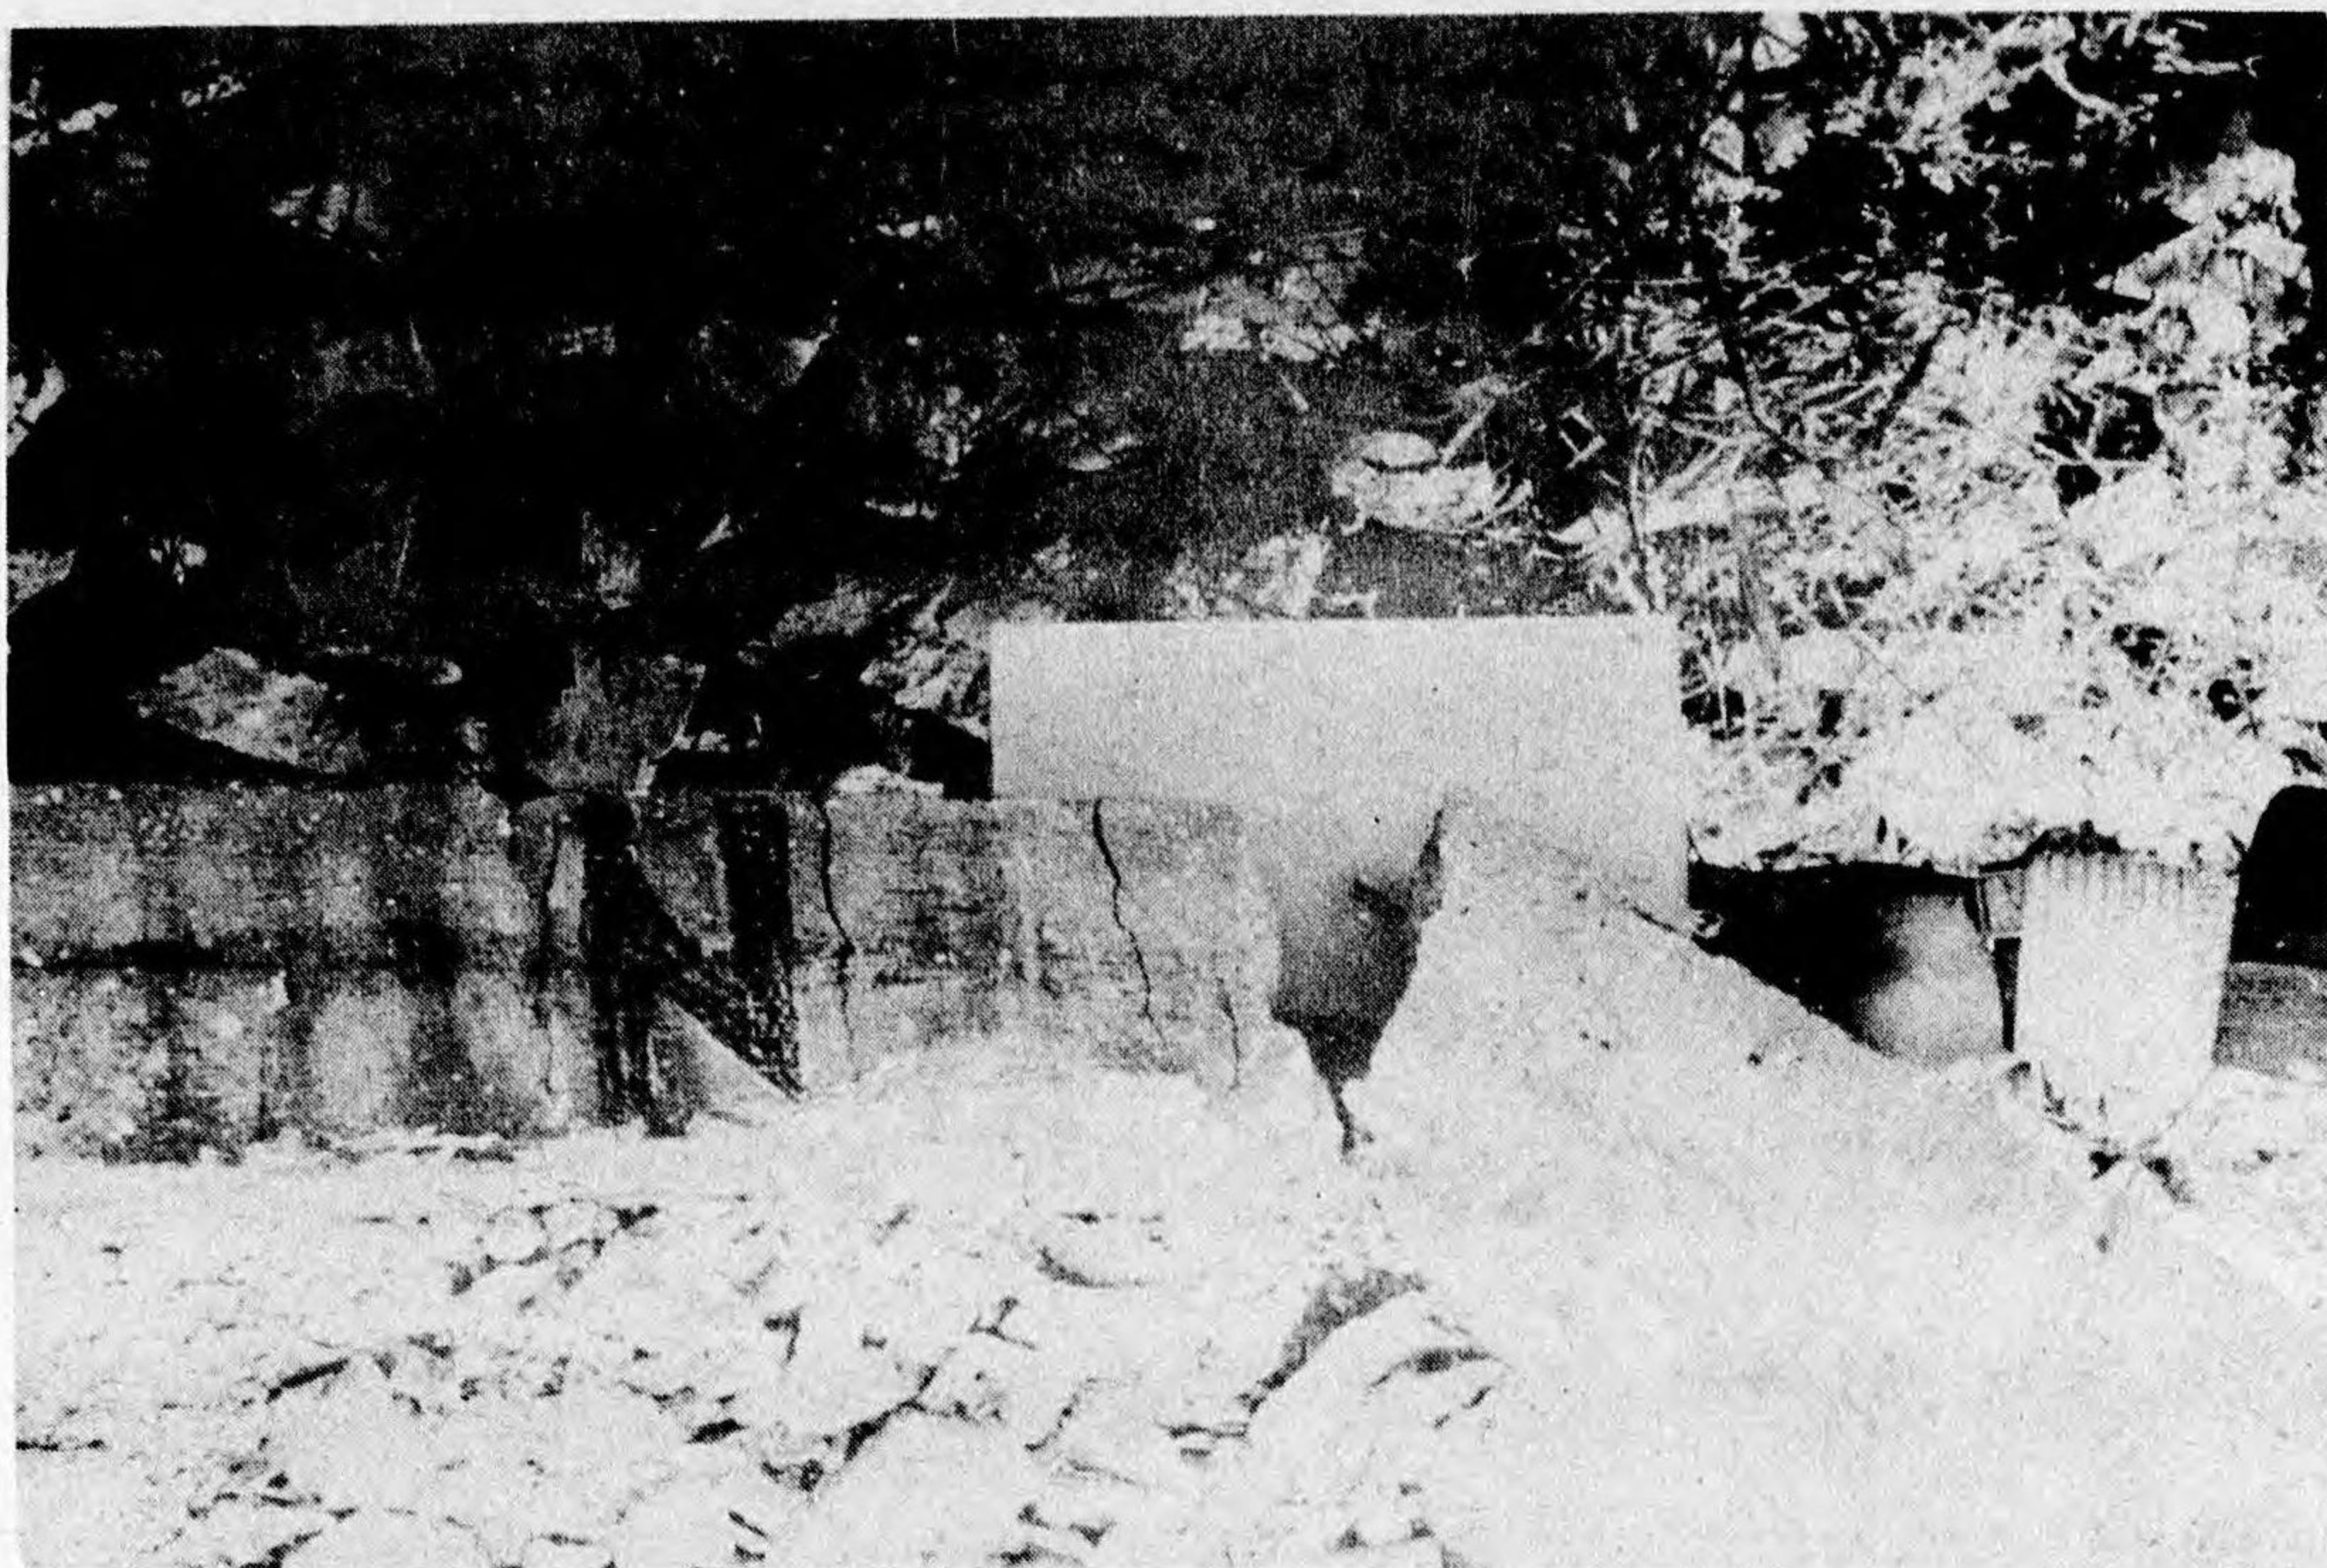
First floor north spandrel beam after detonation of $\frac{1}{2}$ lb of TNT. Note absence of tension reinforcing and consequent cracking.
